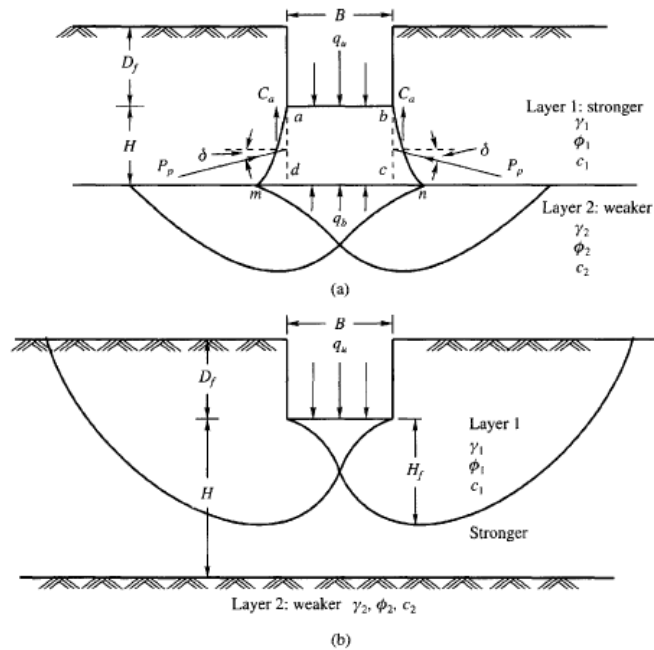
Failure of soil below strip footing under vertical load on strong layer overlying weak deposit (after Meyerhof and Hanna, 1978)
